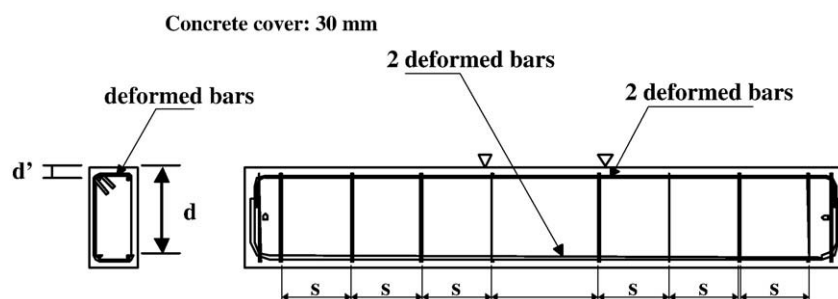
Elevation and cross-section of the reinforced concrete beams.
